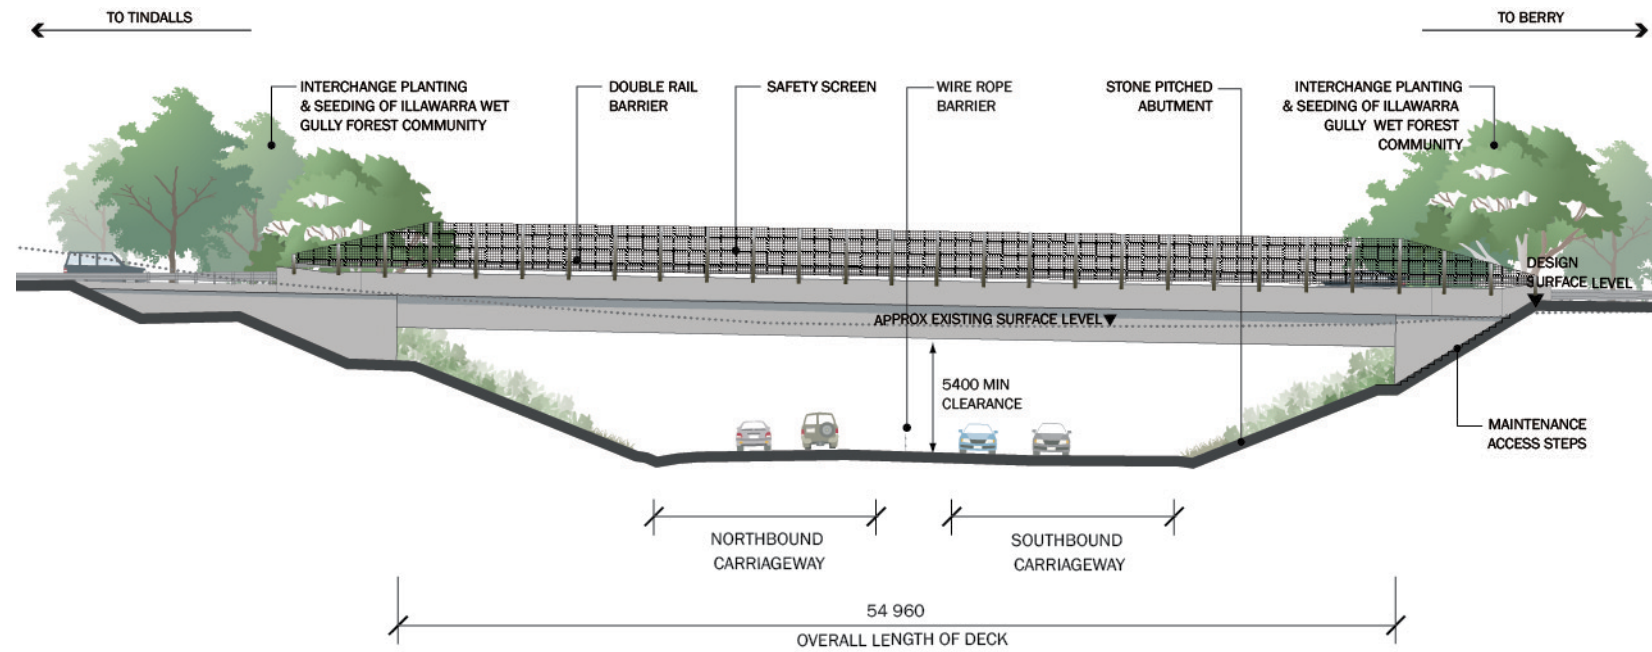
Elevation – Bridge SB06: Tindalls Lane Overbridge (Scale: 1:400@A3)
